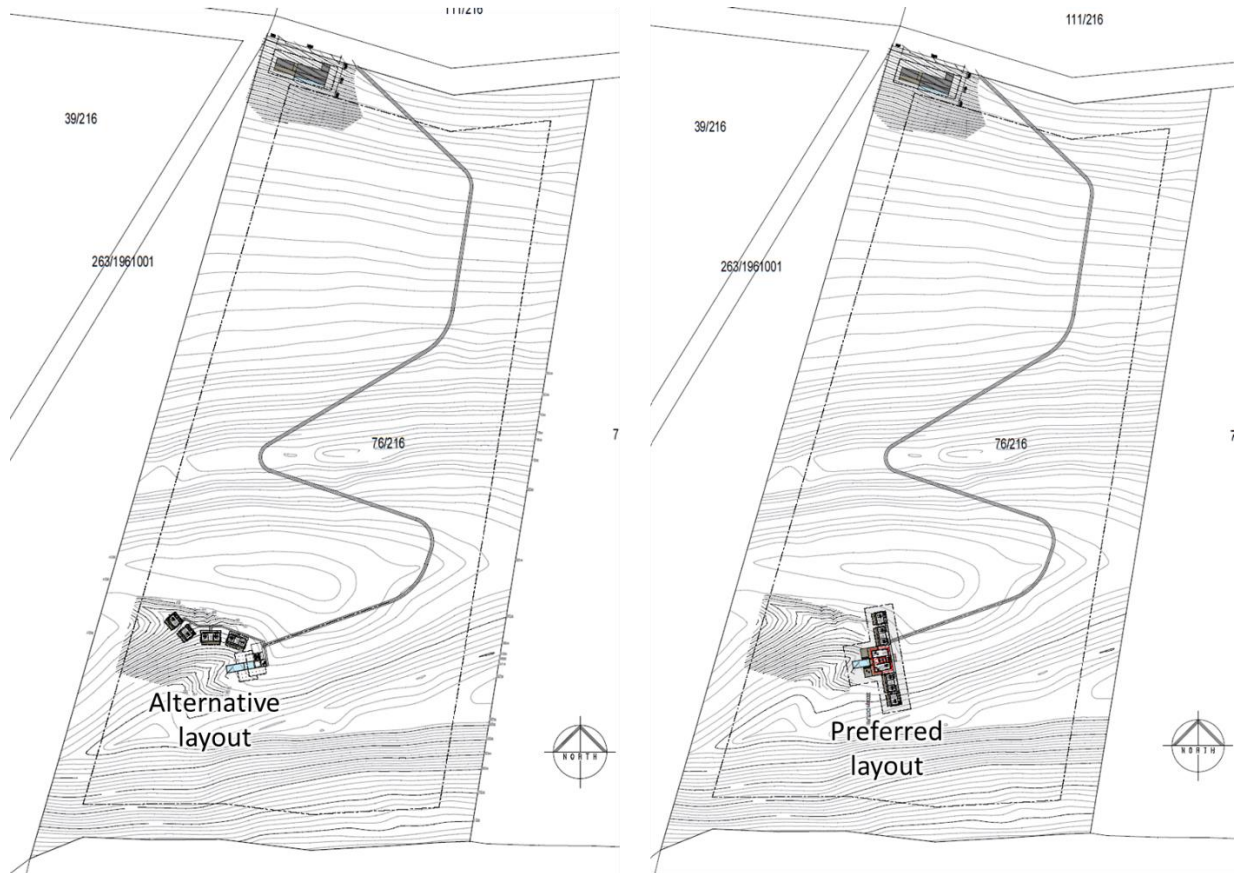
The layout proposed for Uitzicht farm near Brenton on Sean. The southern main dwelling has two alternative layout options proposed by the architects, with the alternative layout depicted on the left and the preferred layout depicted on the right.
